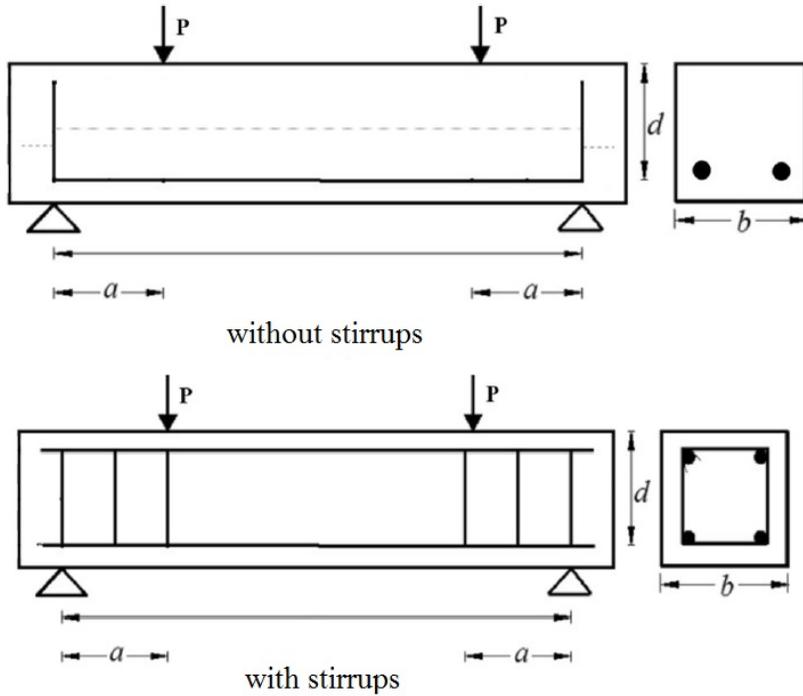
Geometry of RC beam with and without steel stirrups [252].
